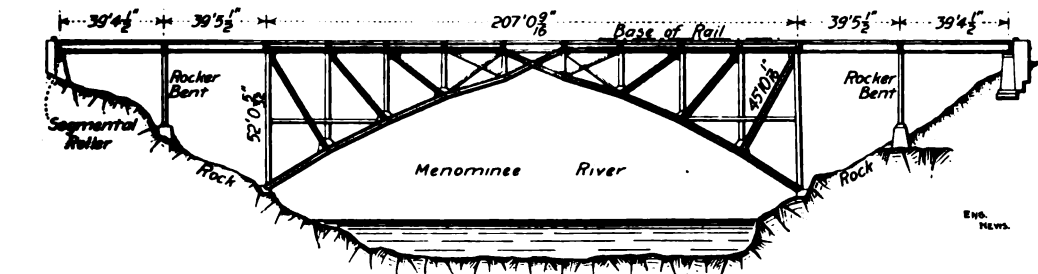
THREE-HINGED STEEL ARCH BRIDGE; CHICAGO, MILWAUKEE & ST. PAUL RY. C. F. Loweth, M. Am. Soc. C. E., Engineer and Superintendent of Bridges and Buildings; Phoenix Bridge Co., Phoenixville, Pa., Contractors.
